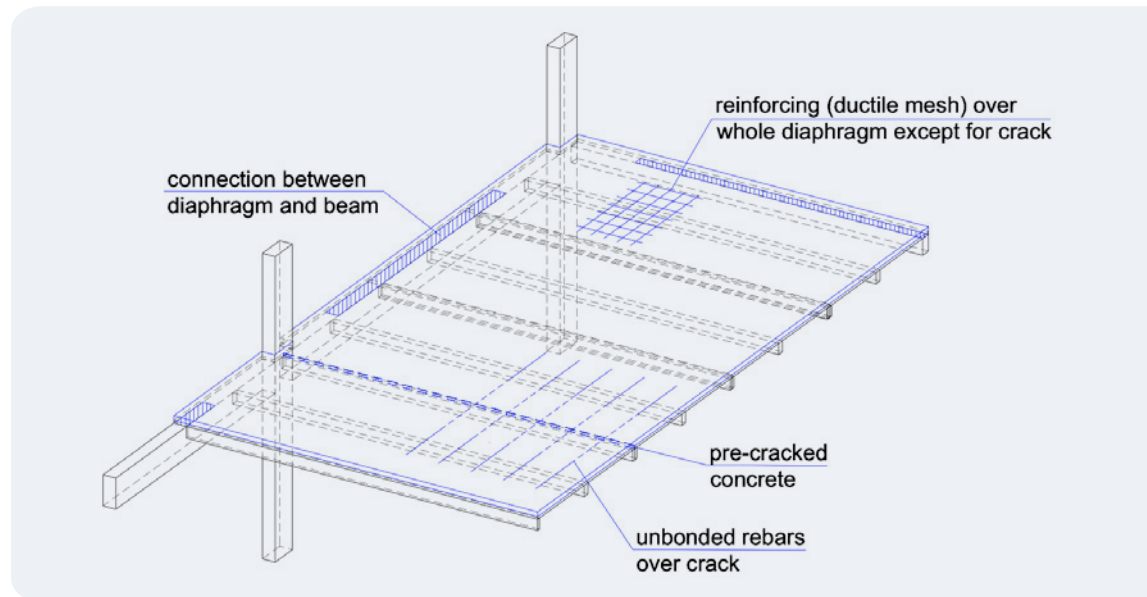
Suggested detailing for a TCC floor in a frame system.
